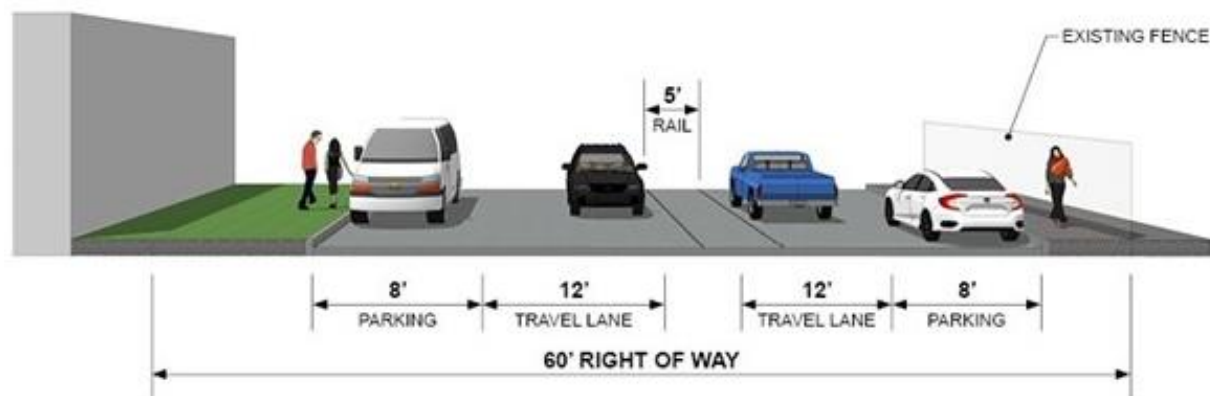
Existing Section C (Typical) - Front Street from Cedar Ave. and Birch Ave.
